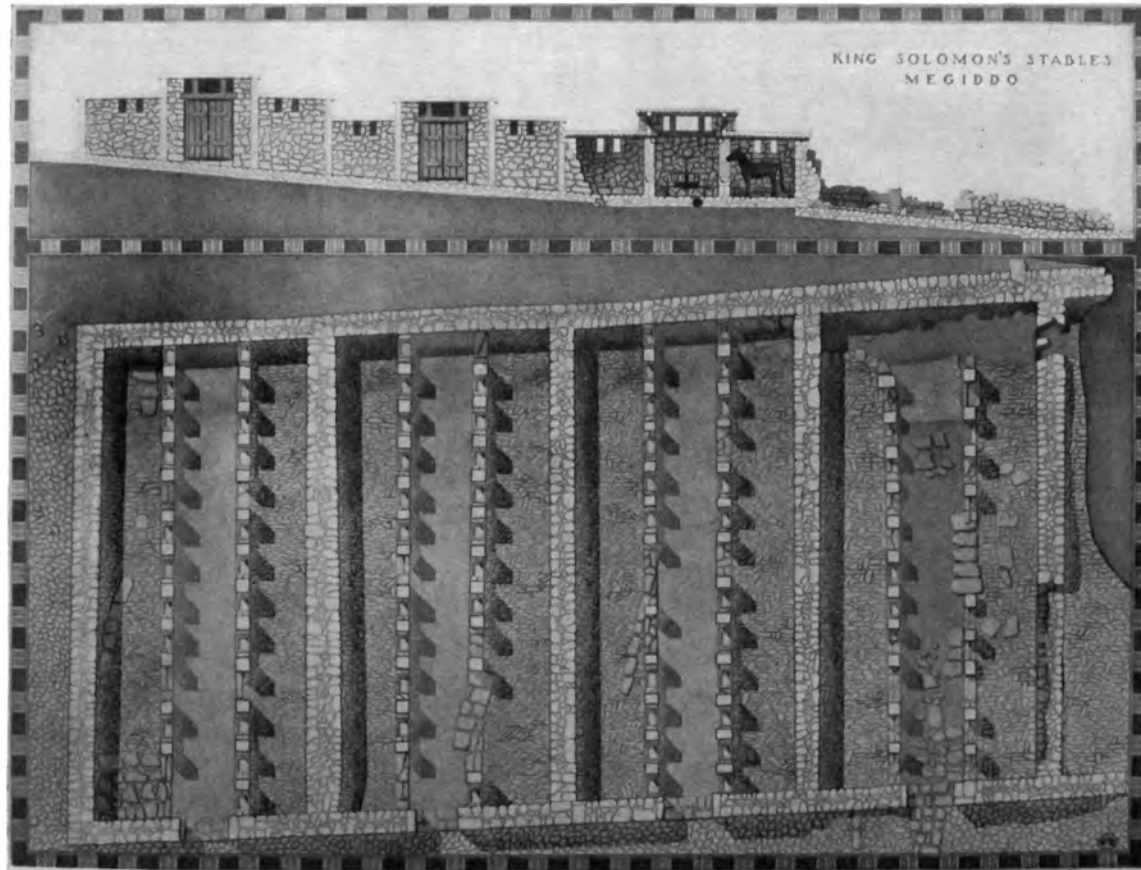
The great stables. Plan and reconstructive elevation by L. C. Woolman
